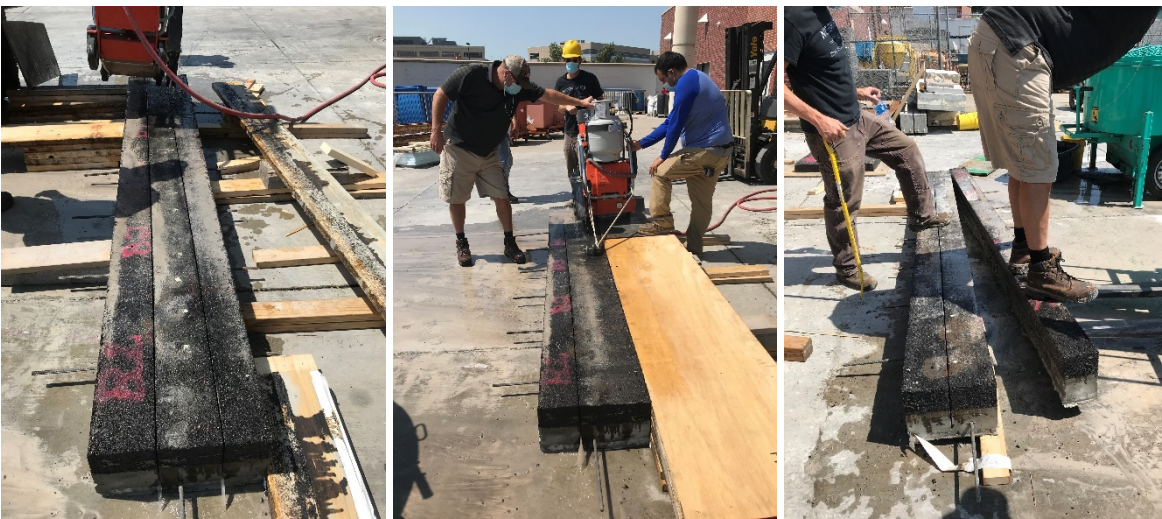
Dissecting Specimen B to evaluate the asphalt-membrane-concrete interface
